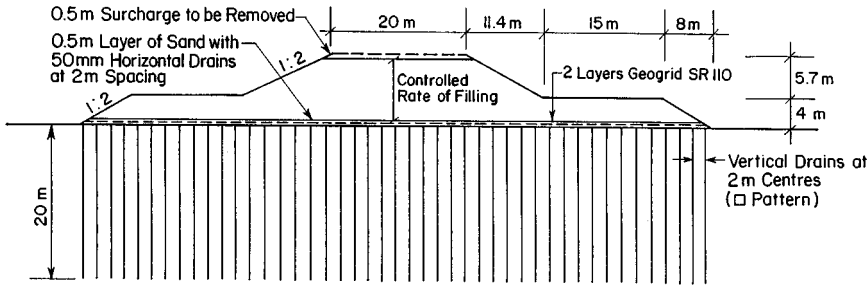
Embankment constructed on preloaded foundation stabilized with geogrids and vertical drains
